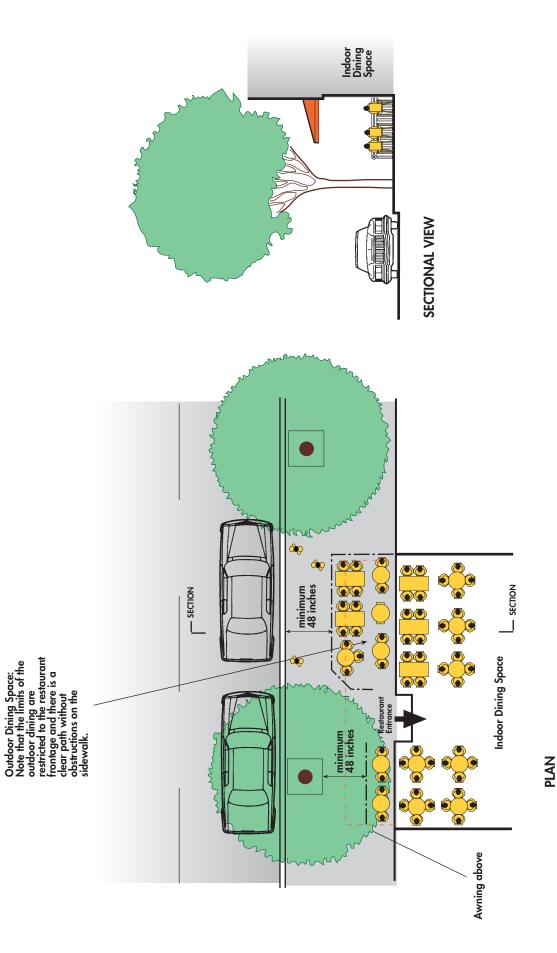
A.24: Typical Layout of Outdoor Sidewalk Dining Space
